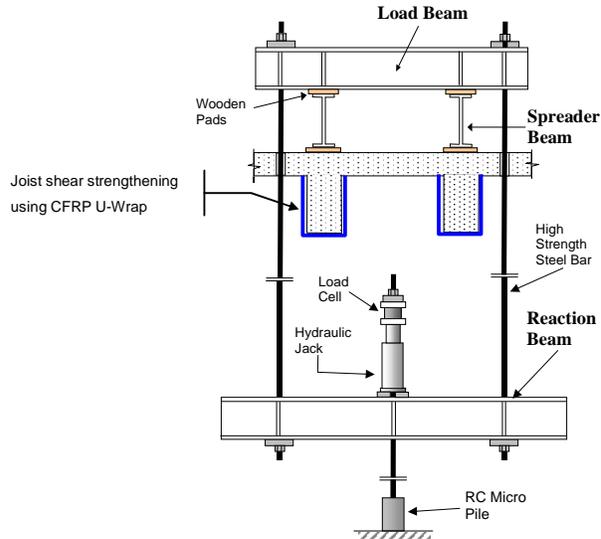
Cyclic Load Test Setup for Test 1 and Test 2
